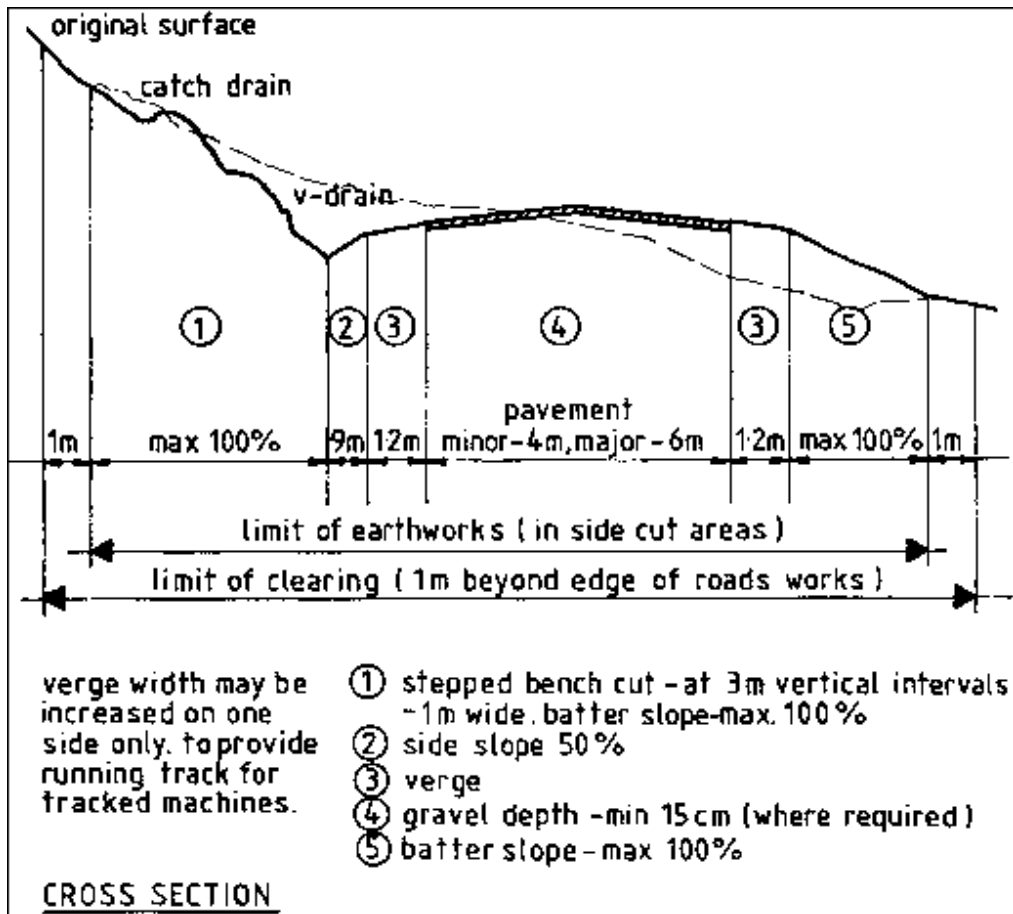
Example of ideal road layout. Wear surfaces and finished width will vary according to road type.
